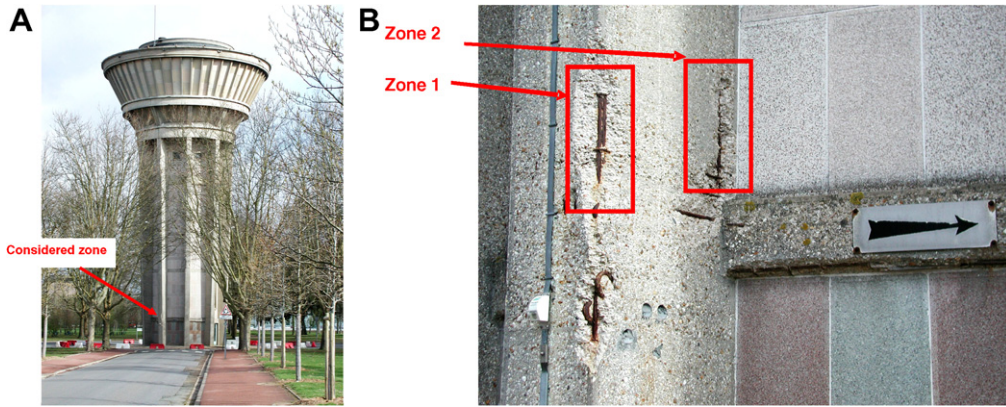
(A) Photograph of the water tower 'Perret', CEA Saclay centre, France; (B) zoom on a column presenting cracks and spalling of concrete.
